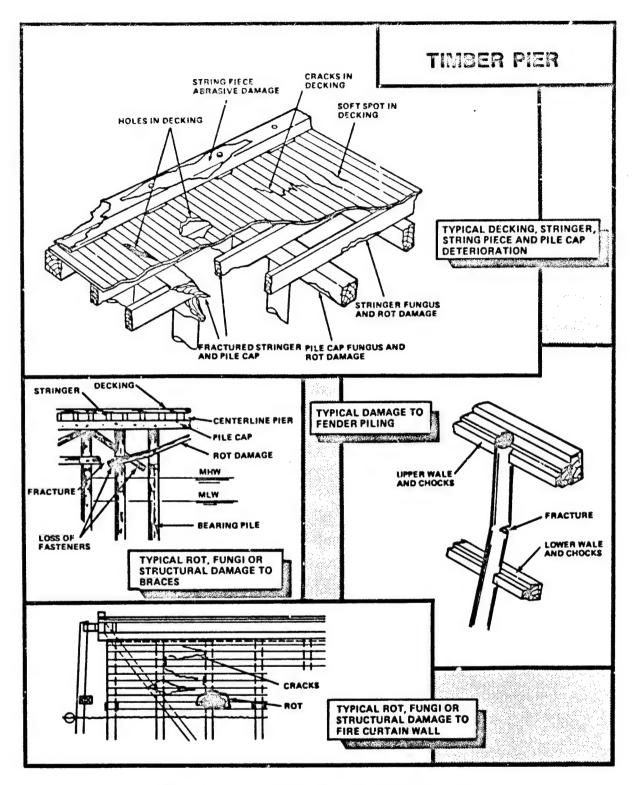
Typical Damage Areas Involving Timber Decking, Stringers, Pile Caps, Fire Curtains, and Fender Piling.
